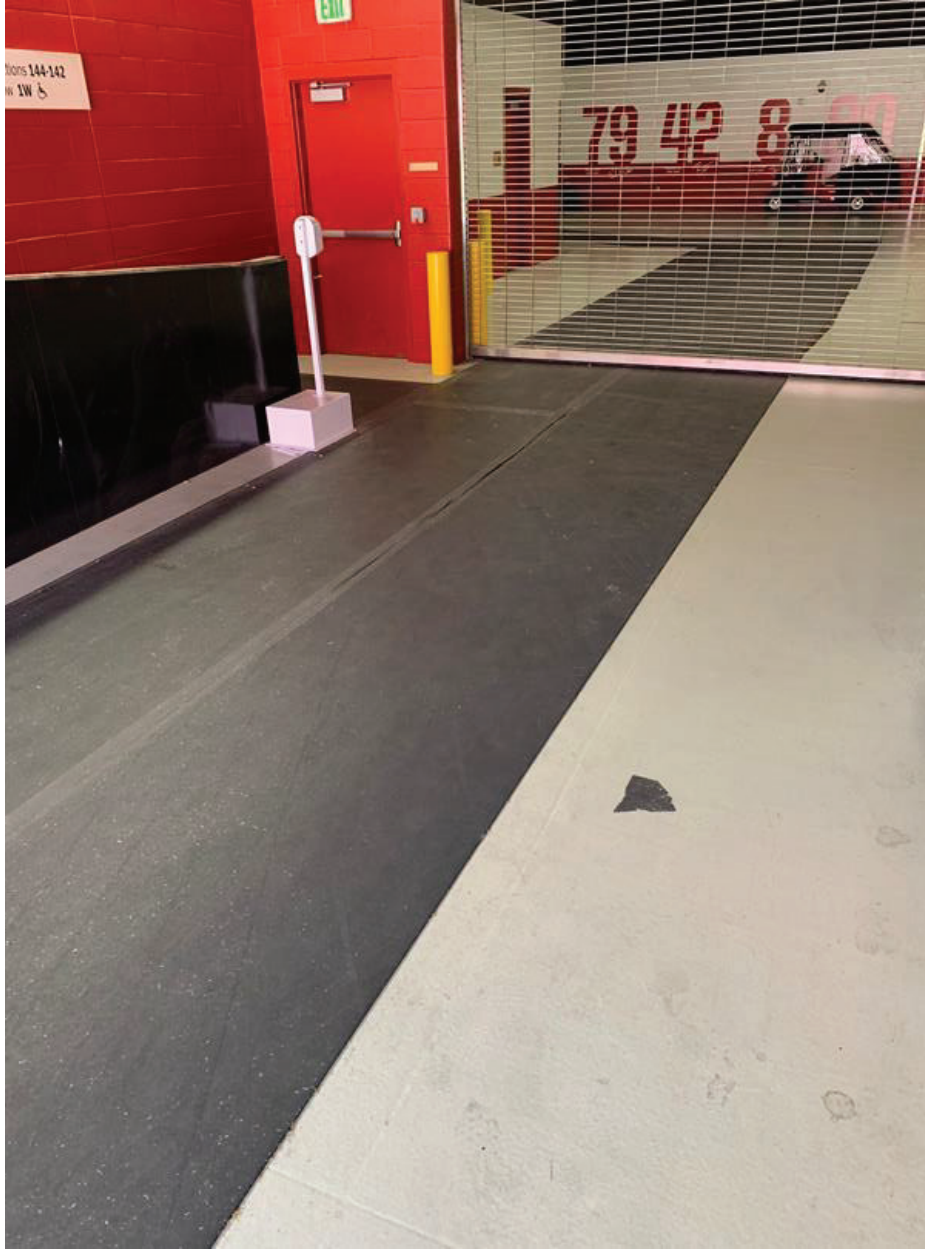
Photo of Northwest Tunnel (BASE BID SCOPE) look into corridor tunnel area from field area.
